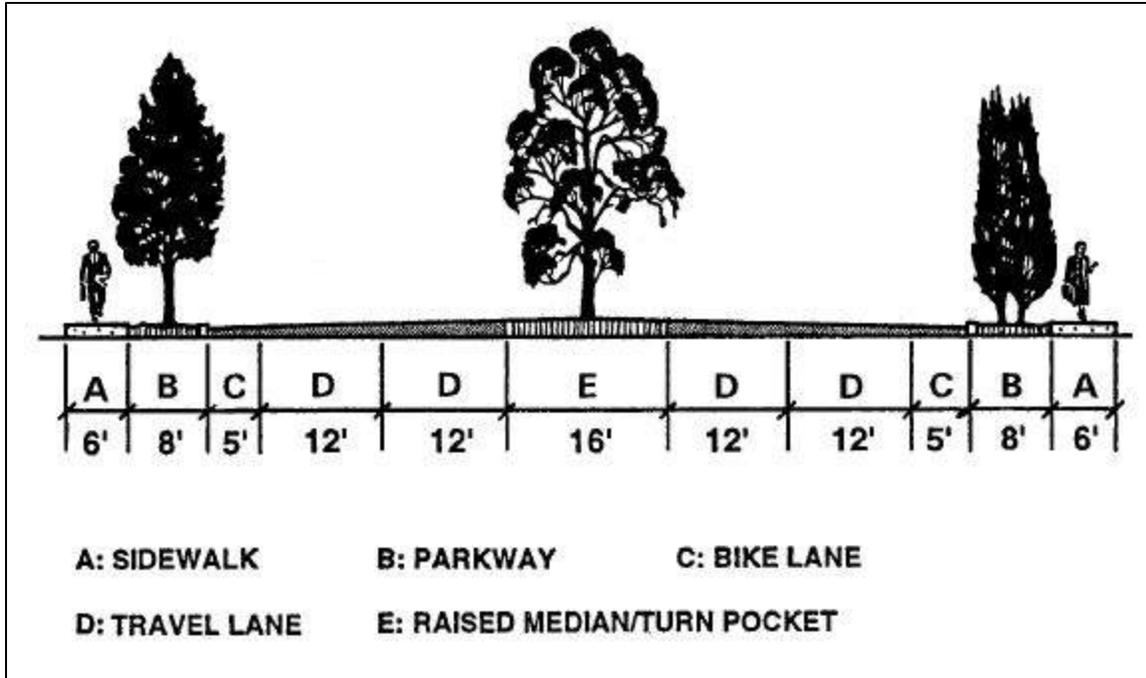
Illustration of Highway 227/Broad Street improvements
